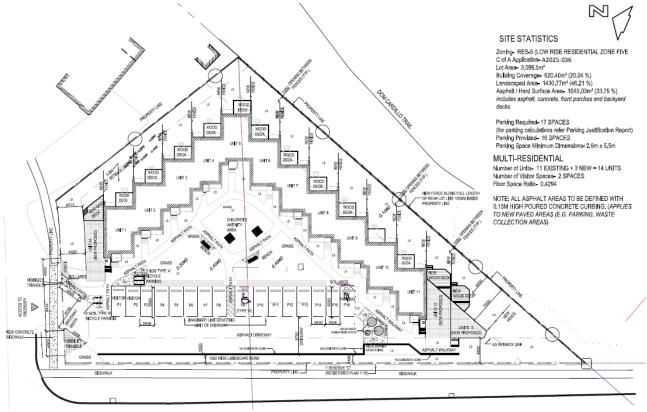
Conditionally approved Site Plan: 15 Scenic Drive
